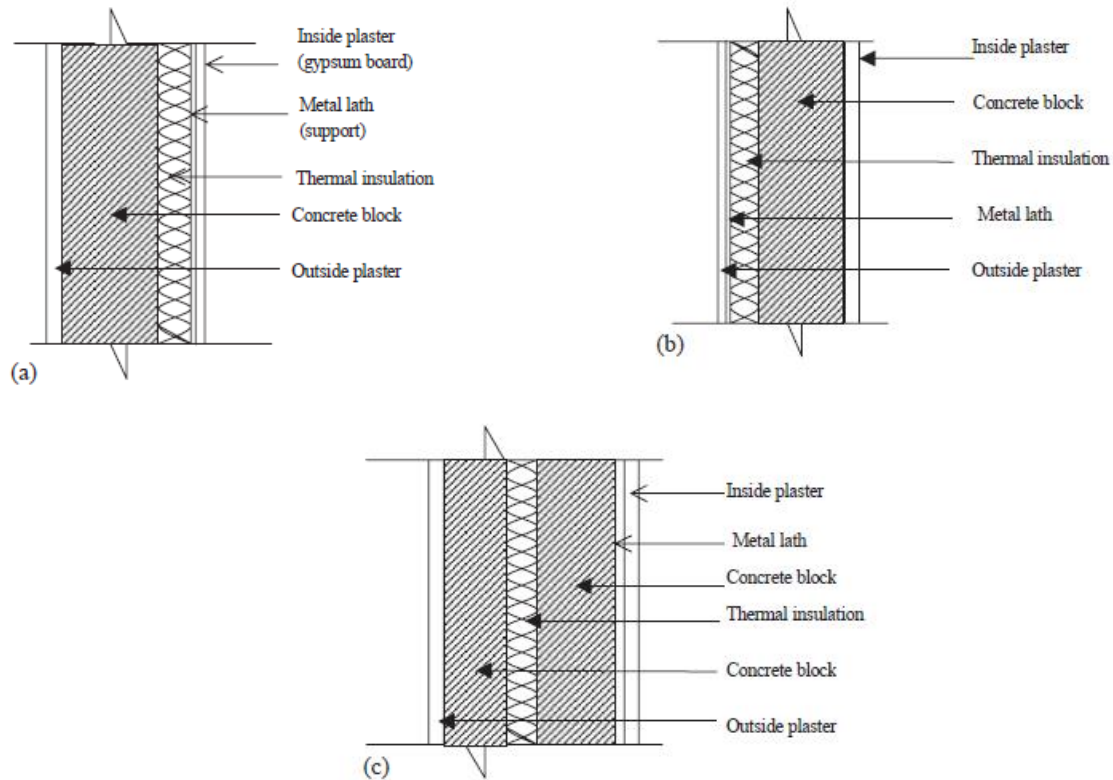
Options for installing wall insulation. a) inside, b) outside, c) middle.
